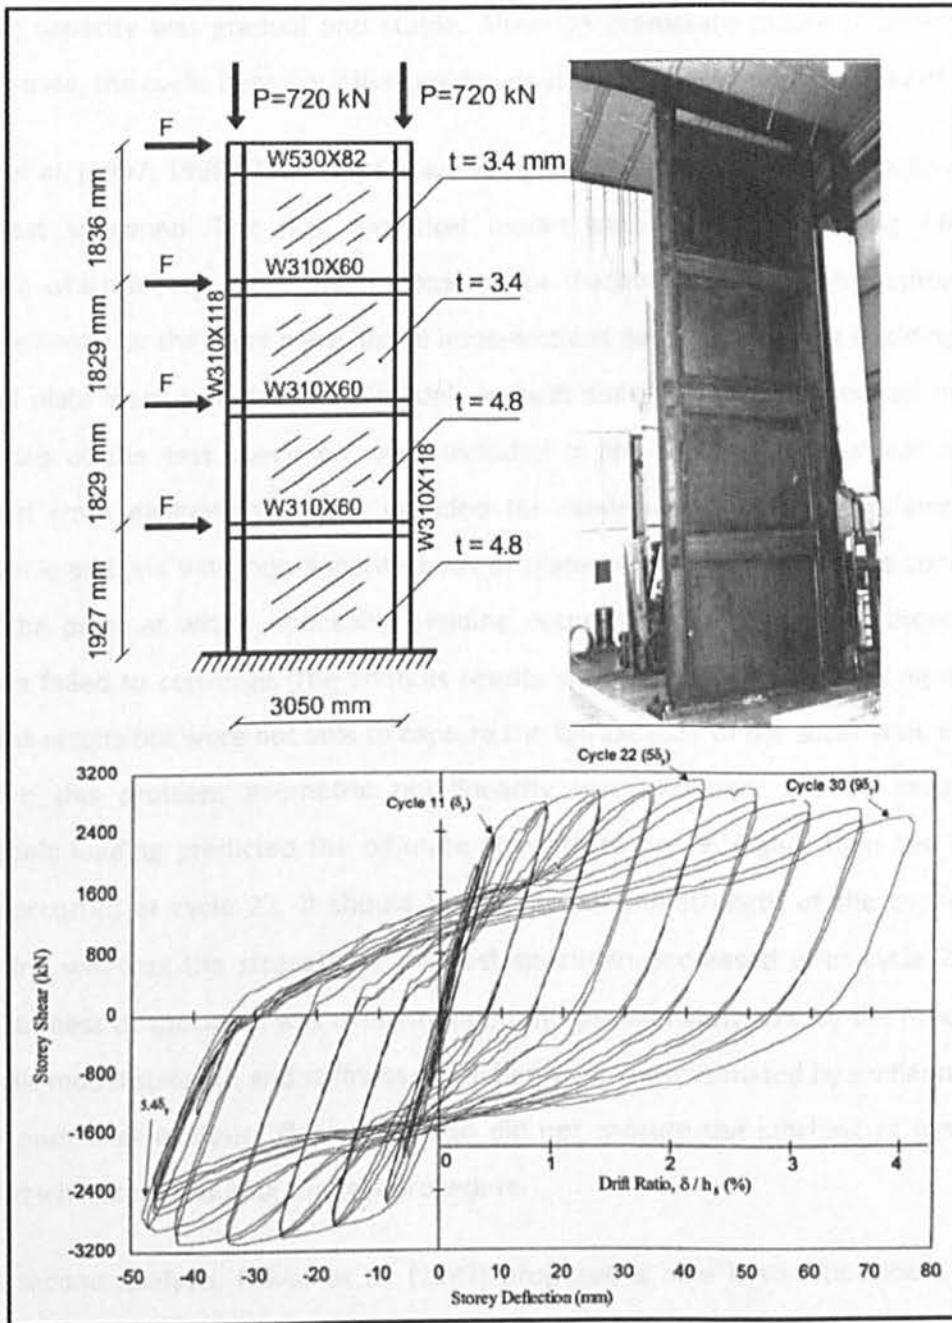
Scheme and elevation of test specimen with hysteresis curves for first storey (Driver et al., 1997) (photo courtesy of R. Driver)
